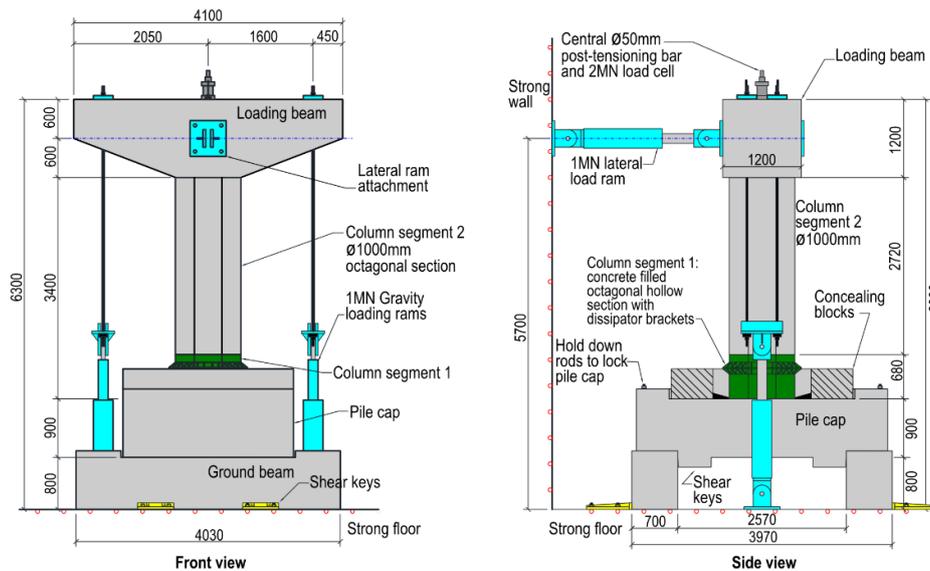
Schematic of specimen showing dimensions and test set up.
